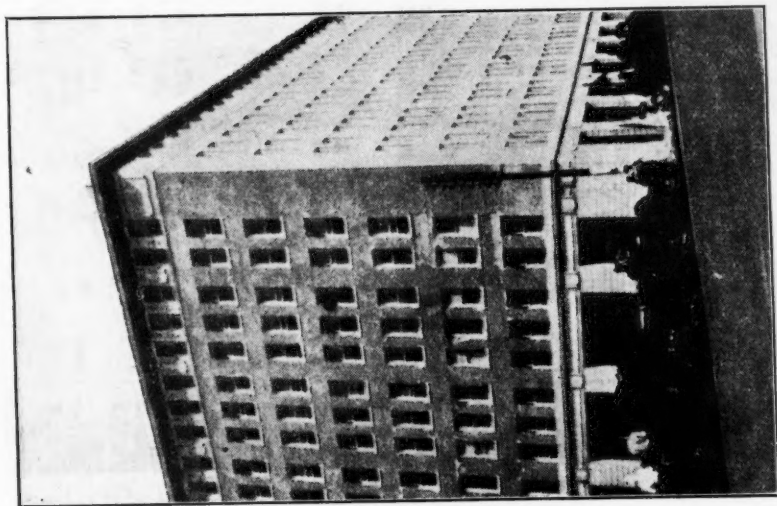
MARUNOUCHI BUILDING AFTER 1923 EARTHQUAKE.
